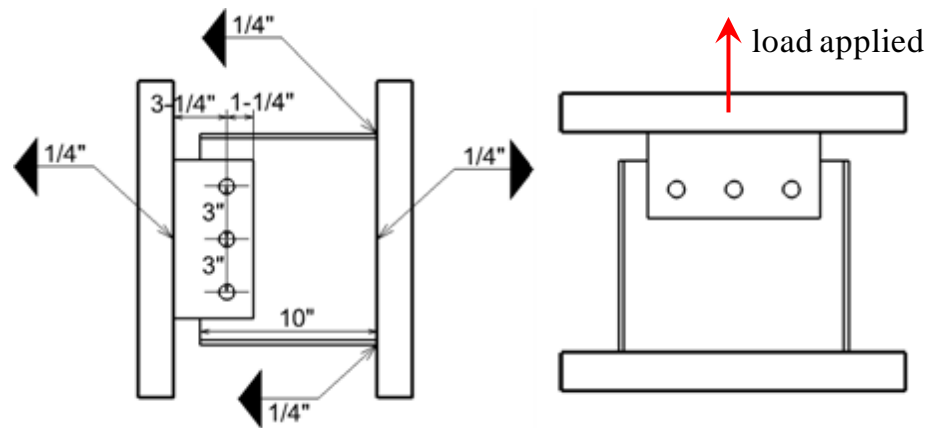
Axial tension test specimen dimensions, (Guanyu 2011)
